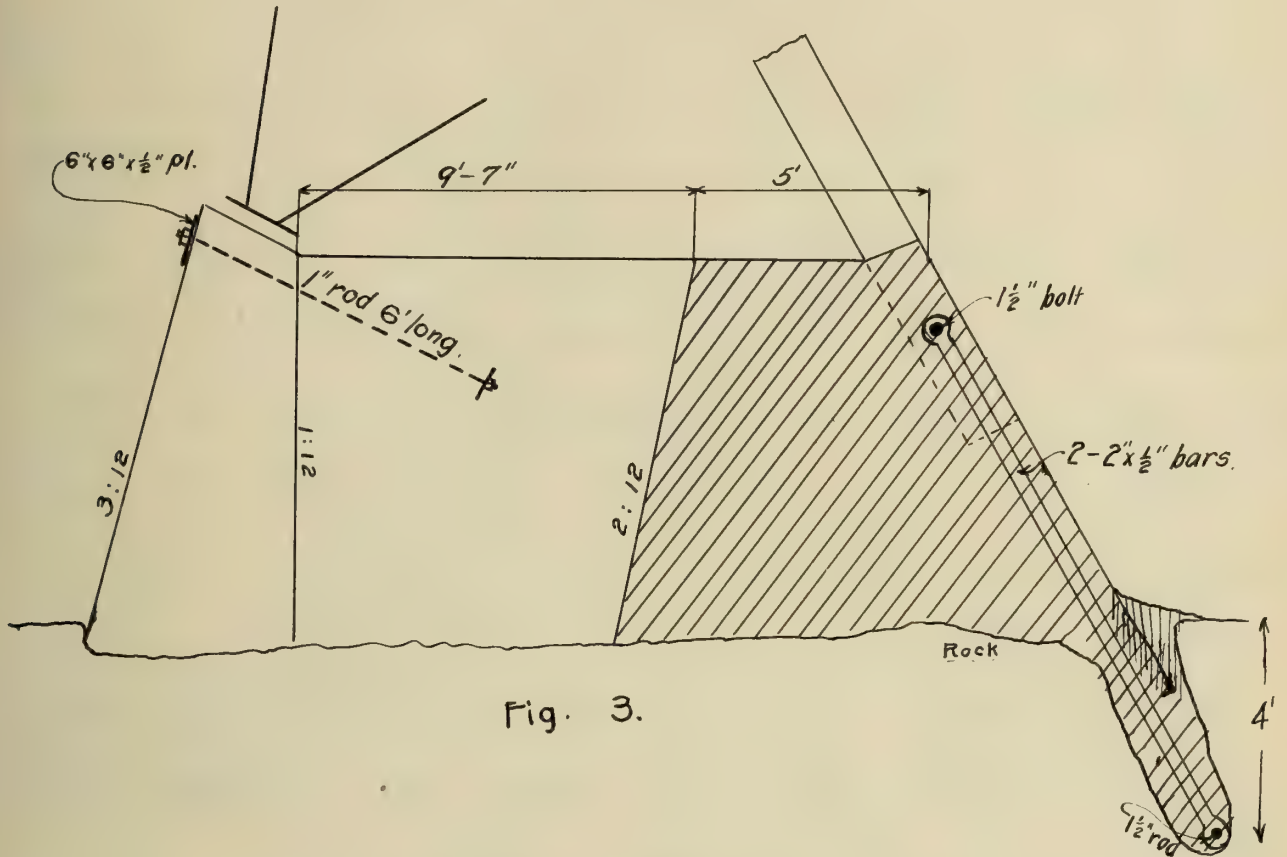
is an elevation of one pier with section of the connecting wall; Fig. 4. is a plan of the same.
